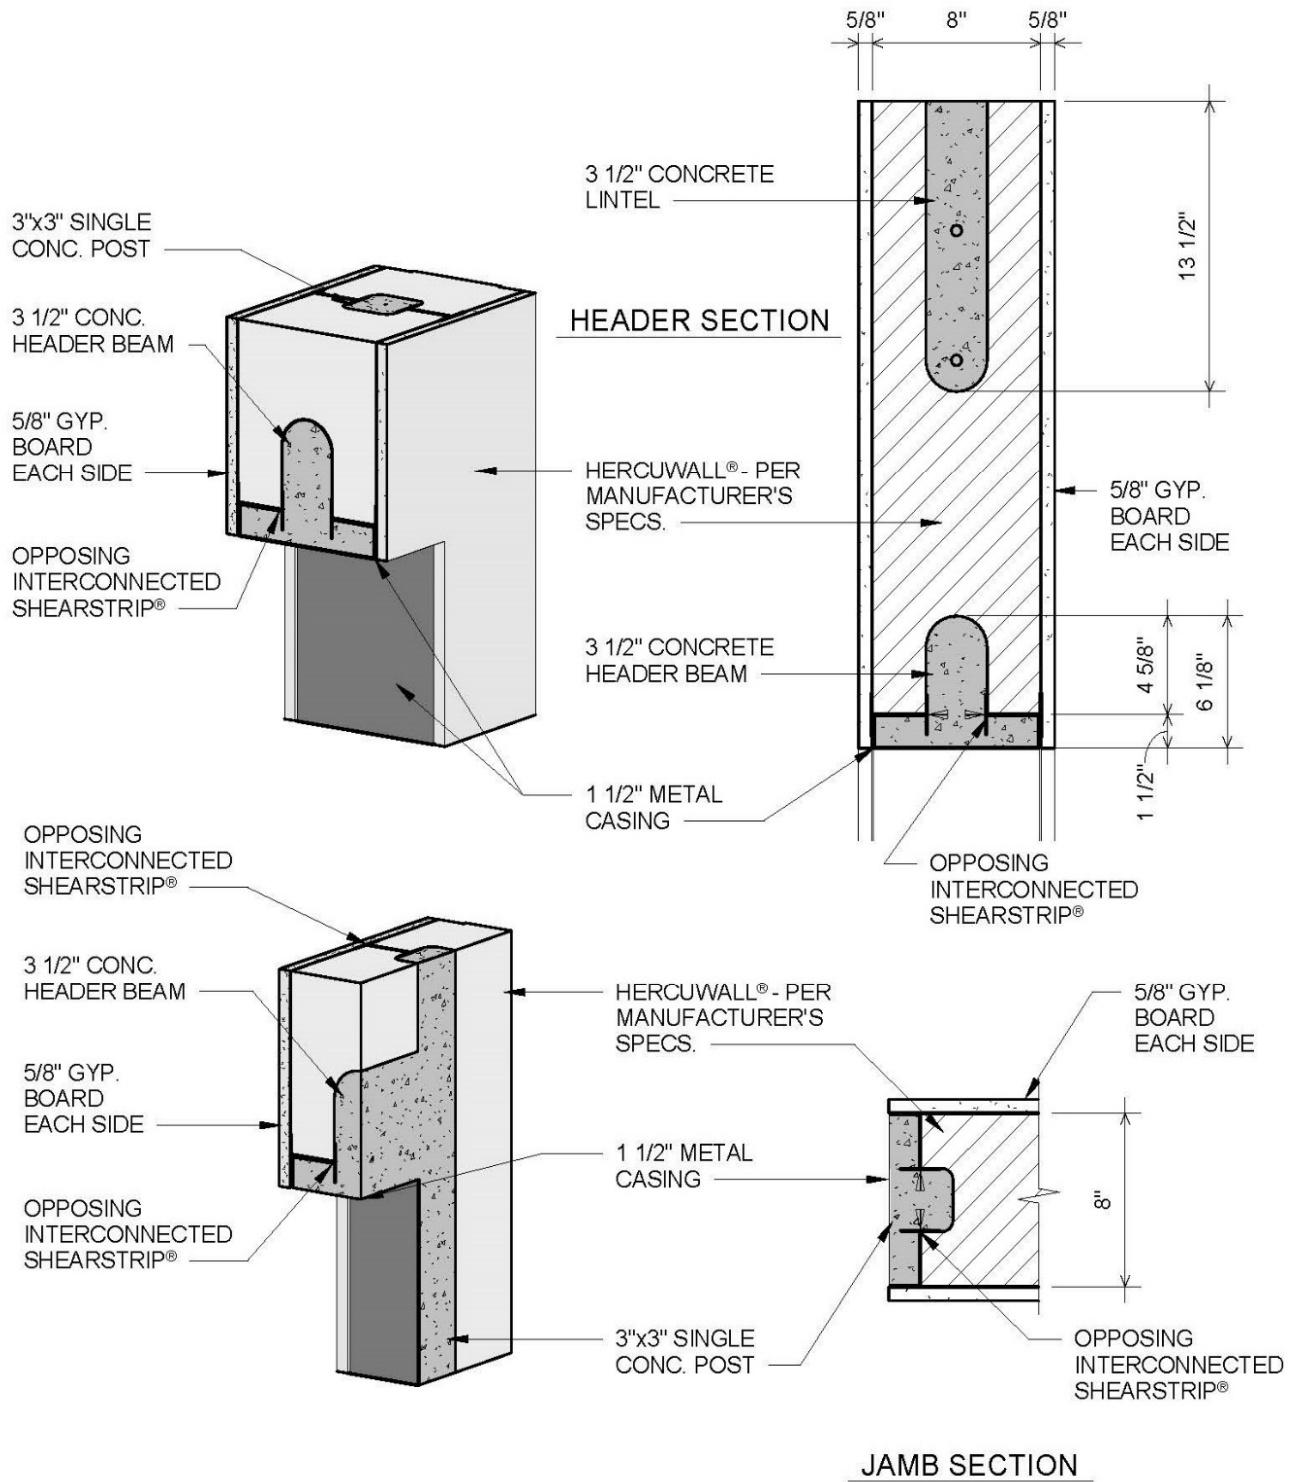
HERCUWALL® SERIES 8 TYPE S AND TYPE SW – PERIMETER DESIGN OF DOOR AND WINDOW OPENINGS WHEN USED IN BUILDINGS OF TYPES I, II, III OR IV CONSTRUCTION
